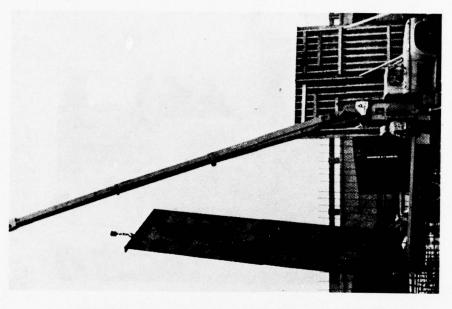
Hydraulic crane (courtesy of American Concrete Institute 59)
